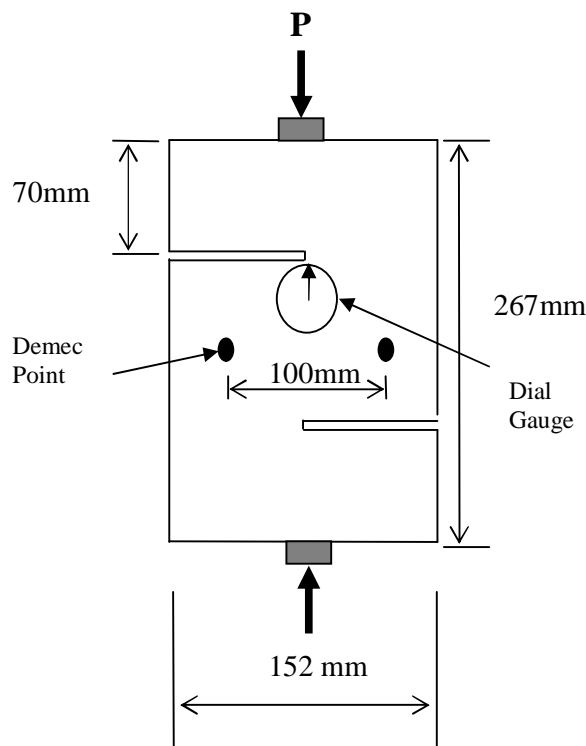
a) Location of Demec Point and Dial Gauge for Double L-Shaped Specimens.
